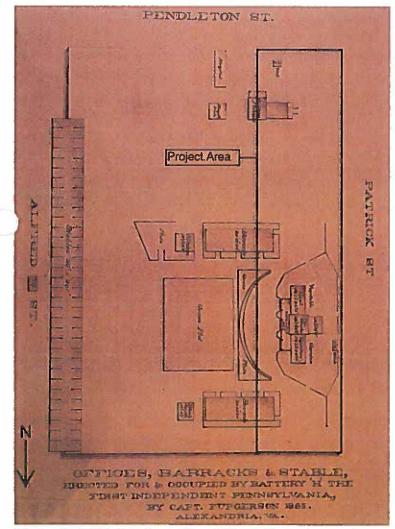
1865 site plan of the Offices, Barracks, and Stable of Battery H, the First Independent Pennsylvania.
